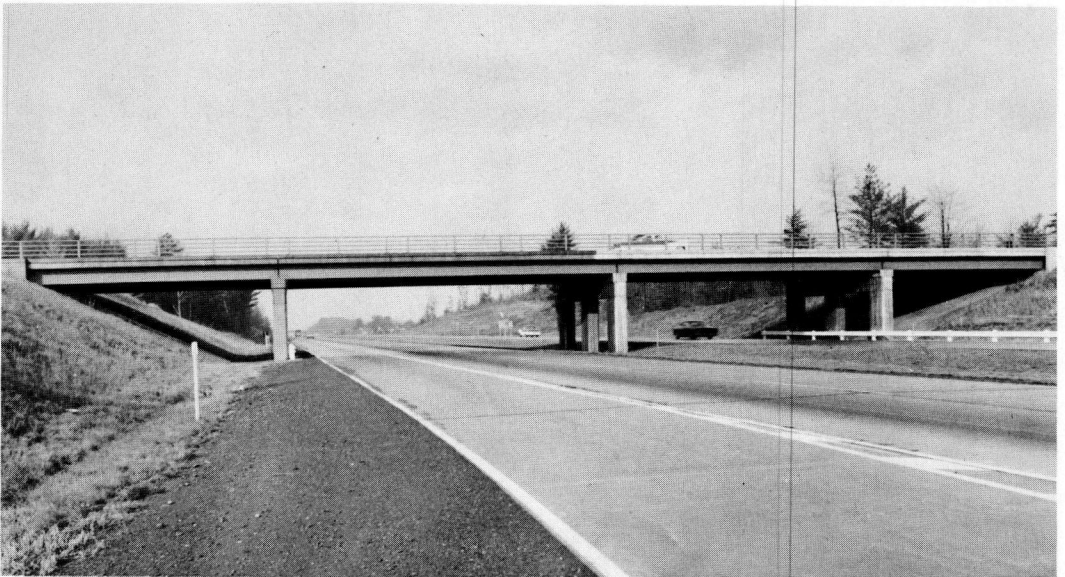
Fascia and pier facings to the right treated with silicone appears much lighter than the rest of the structural concrete (November 28, 1957).
